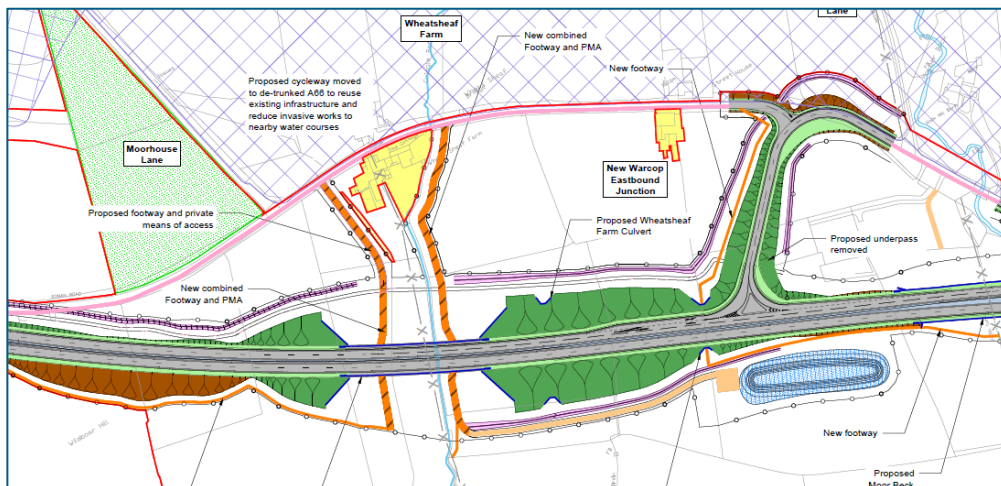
(b) Extract from General Arrangement Drawing (After)
